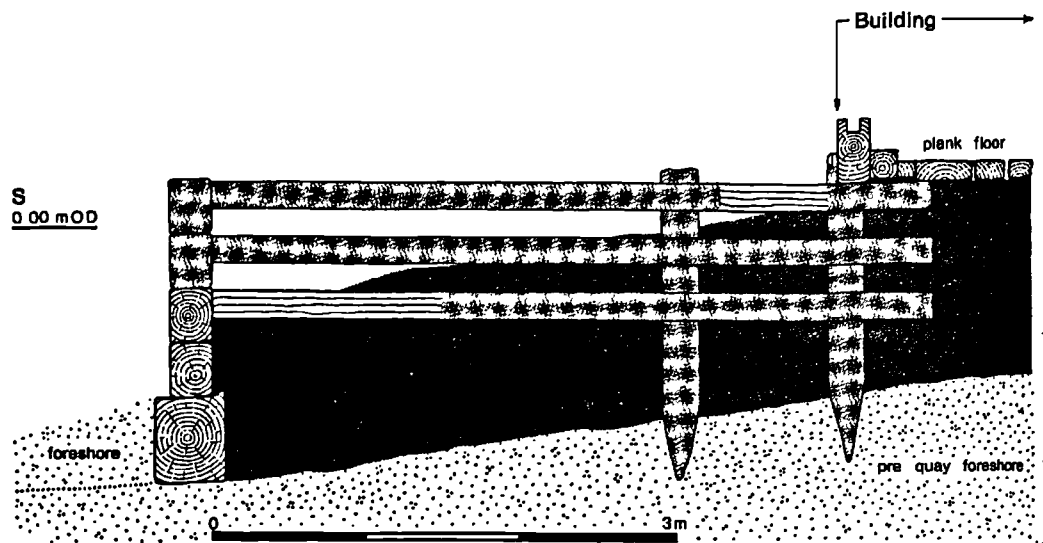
Reconstructed cross-section through Seal House late second century waterfront. Extant timbers are shown with grain, from Brigham (1990)
